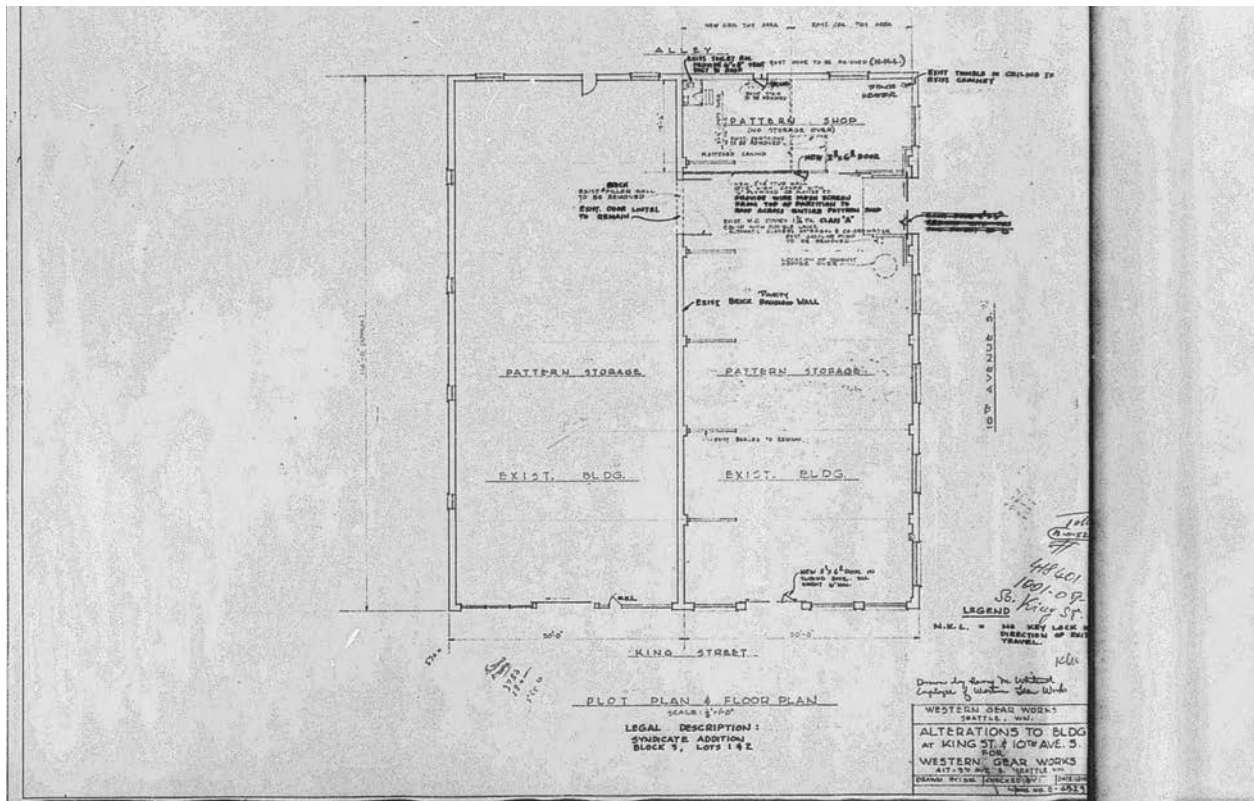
1001-1005 S. King Street - Pattern Shop Plans (12/11/52)
